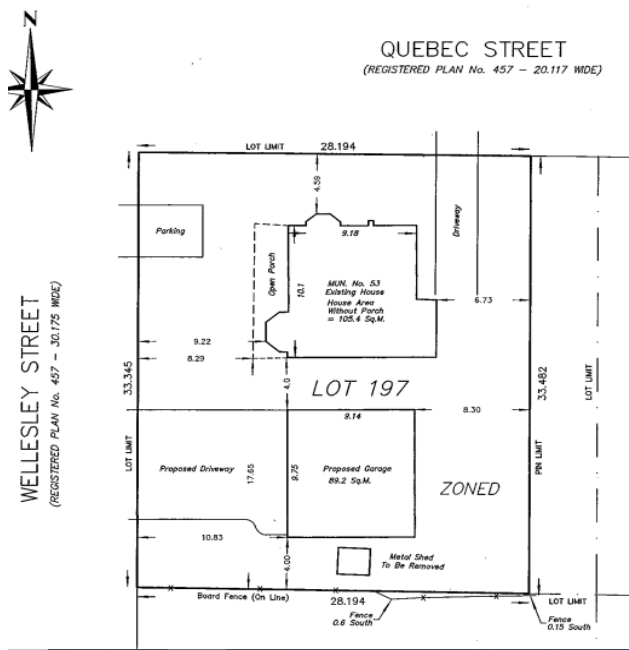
and 3, below, show the submitted proposed site plan and elevation drawings, with the new accessory building to the East of Wellesley Street and South of the existing dwelling.
